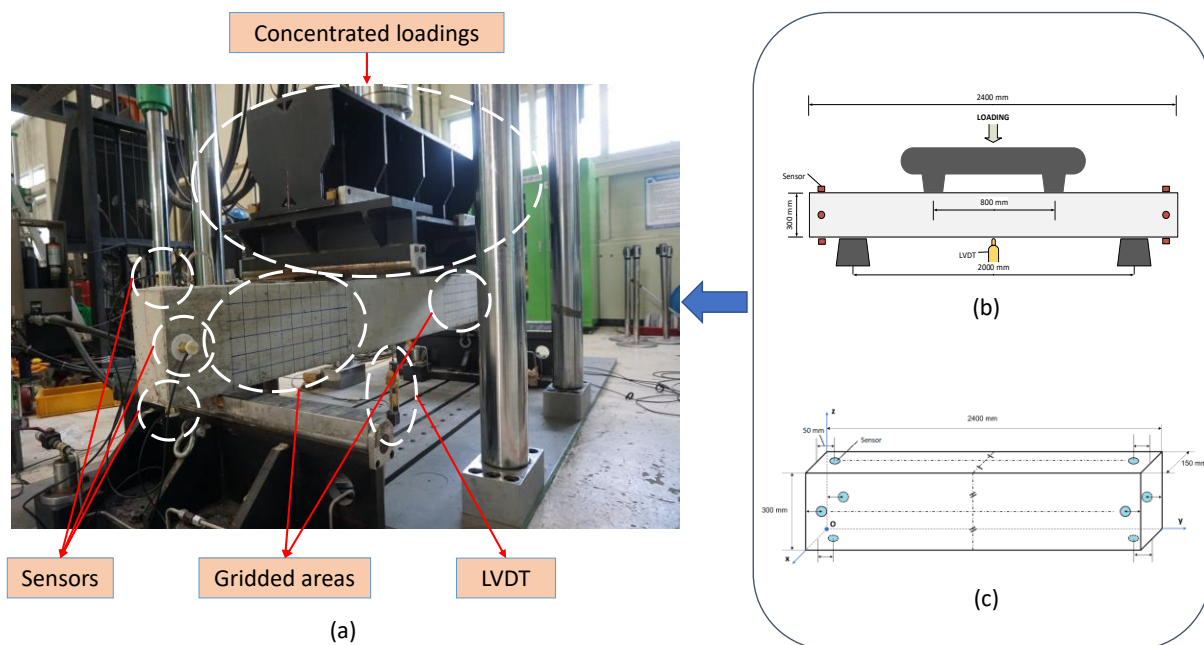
Experimental setup of the four-point bending test on reinforced concrete beam: (a) pictorial of the specimen under test, (b) schematic of the four-point bending arrangement, and (c) placement of sensors on the specimen.
